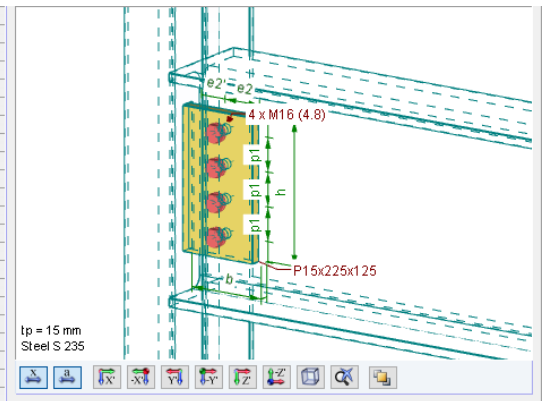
Defining dimensions of fin plate, bolt and weld parameters
